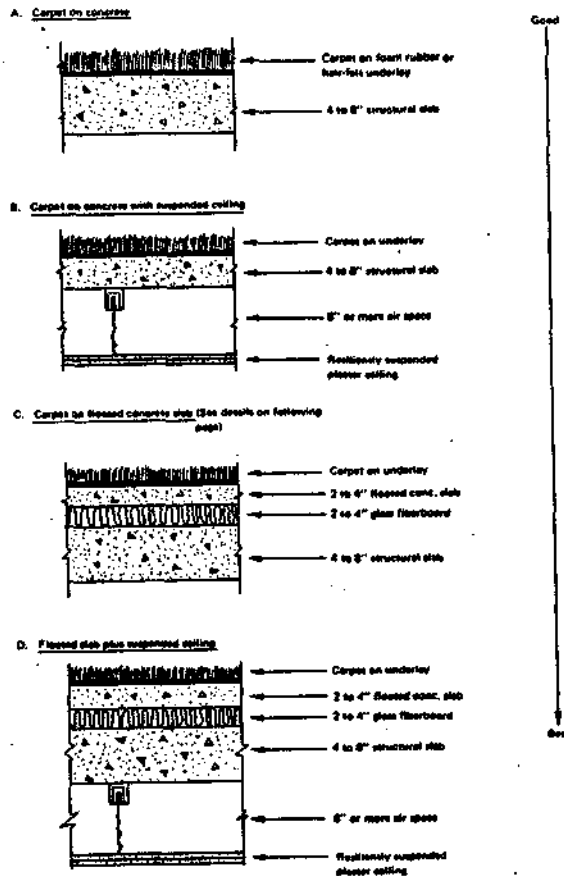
Floor ceiling construction for impact insulation (Egan, 1972)
